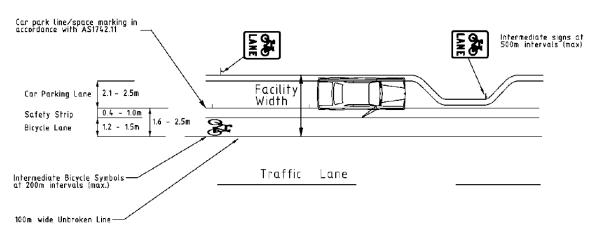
Typical bicycle/car parking lanes layout (parallel parking)
